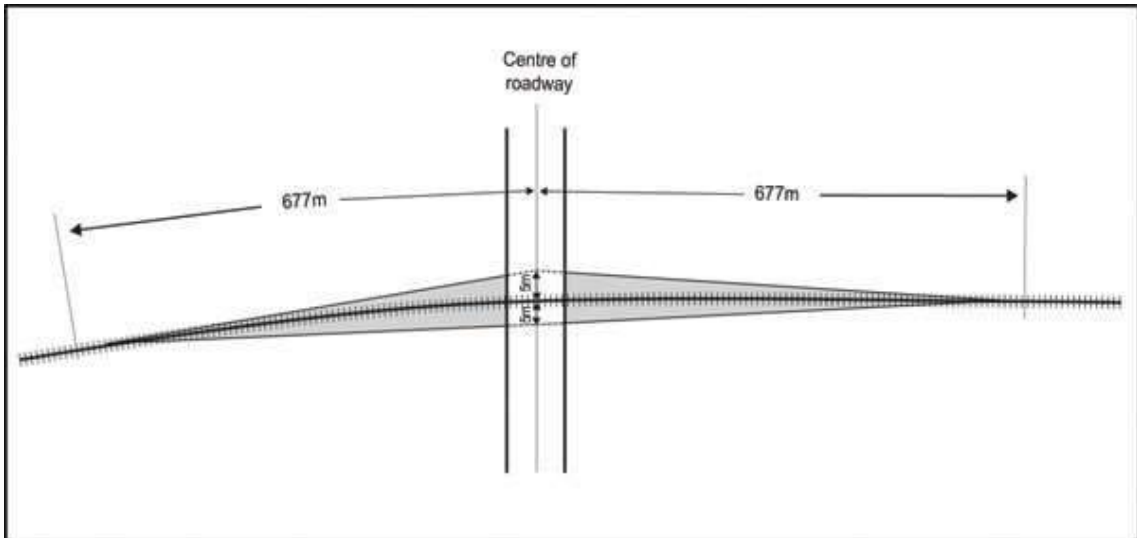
Approach sight triangles for rail level crossings with 'stop' or 'give way' signs
